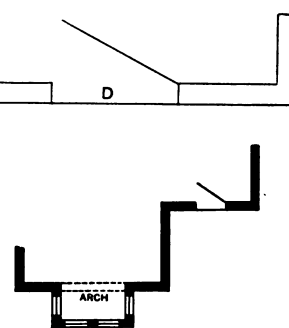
Front of Main Floor Plan Drawn to a Scale of 1-16 Inch to the Foot.
